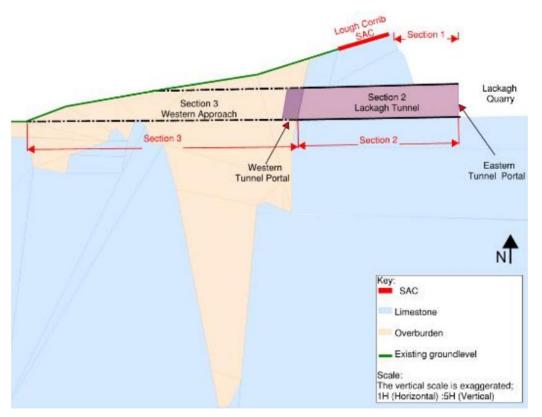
Schematic cross section of Sections 1-3 at Lackagh Tunnel
